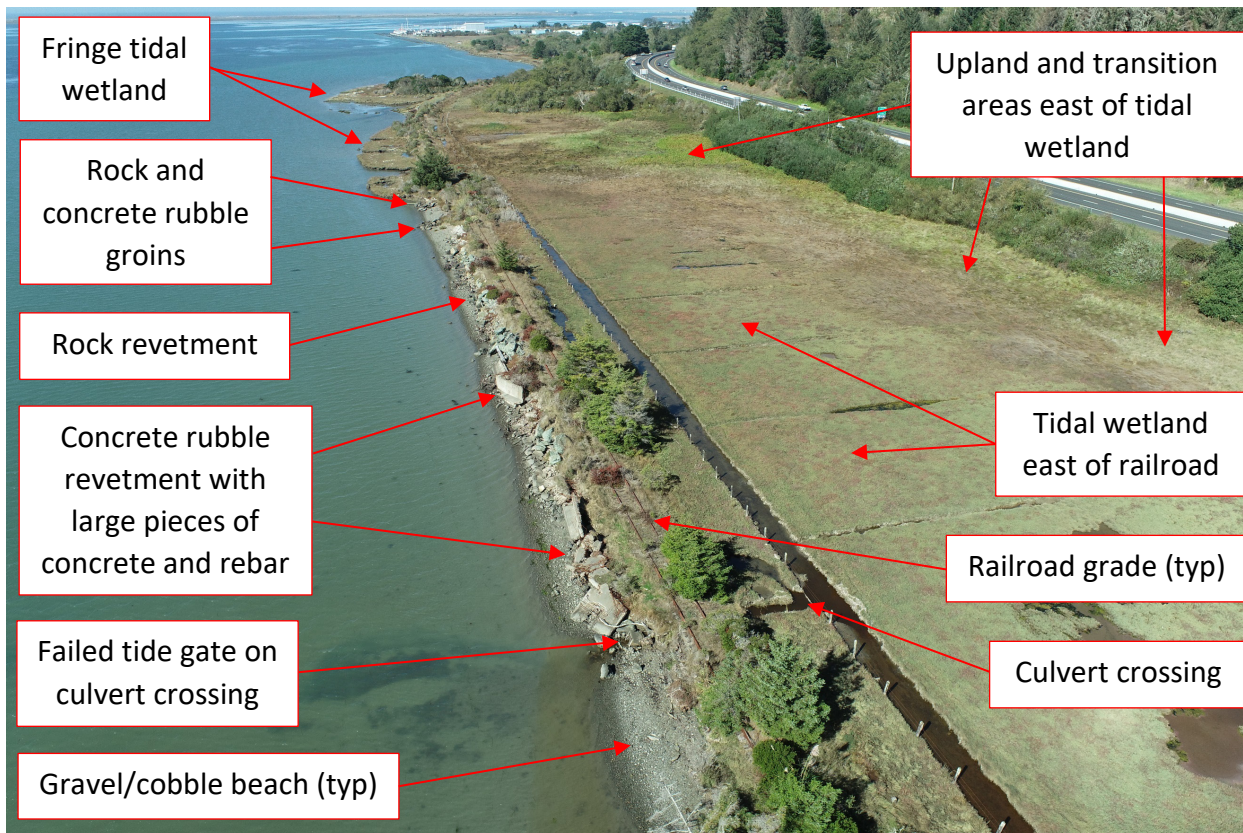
2023 oblique aerial view looking north along Shoreline Reach 3 showing an armored section of shoreline with rock and concrete rubble revetments, tidal wetland east of the railroad grade surrounded by upland area, failed tide gate structure (door missing) on culvert crossing through railroad prism, thin layer of gravel/cobble beach on top of mudflat from eroded railroad prism fill, two small rock and concrete rubble groins at the north end armored shoreline, and large pieces of concrete and rebar rubble. Drone image provided by County of Humboldt.
